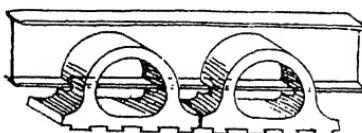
View of Joists and Lintels before the Concrete is deposited.
